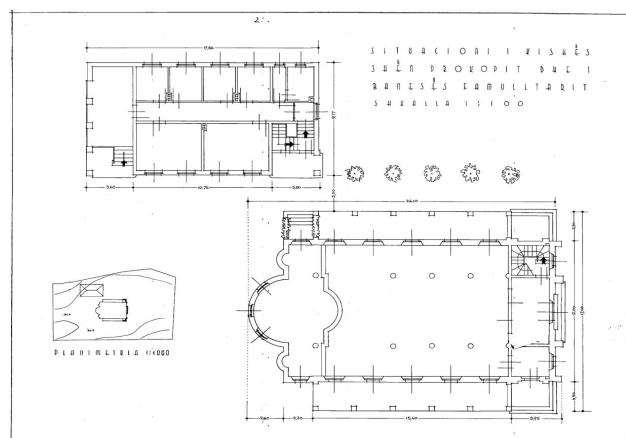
Skënder Kristo Luarasi, Saint Procopius Church, circa 1945, Ground Floor Plan (Technical Central Archive of Construction)
